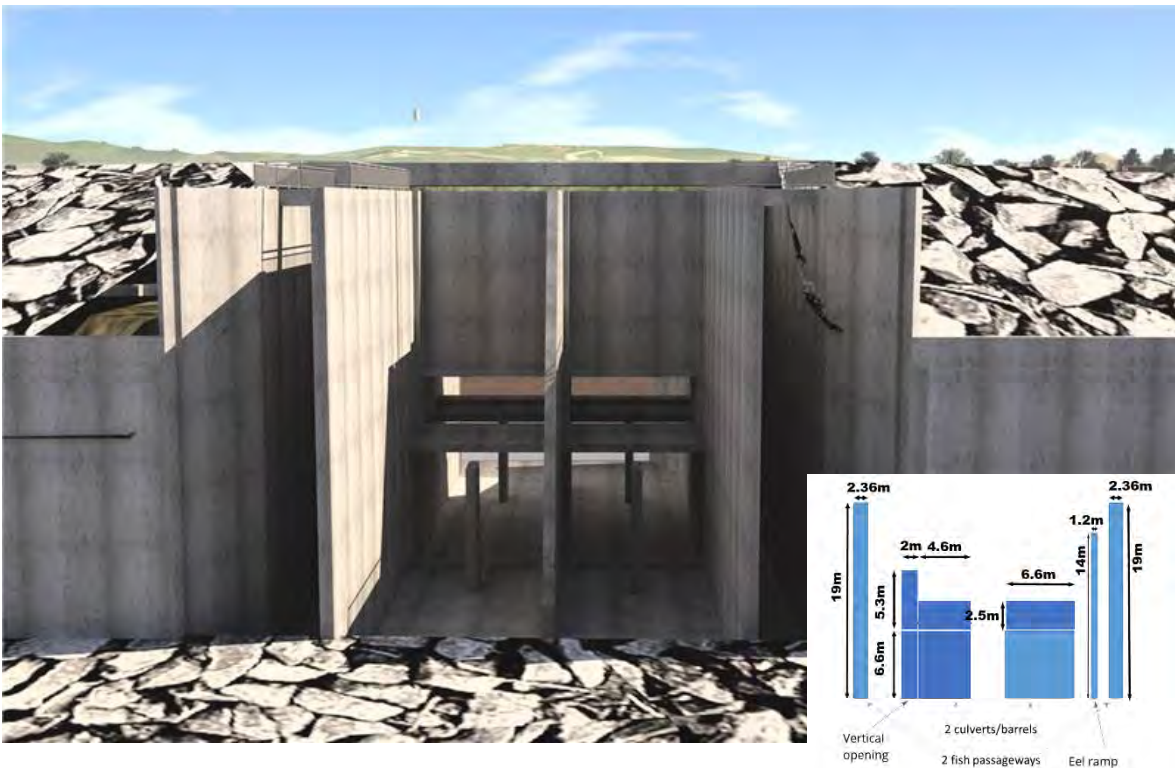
Conceptual Rendering (looking upstream) and Simplified Elevation View Schematic of the New Aboiteau Structure.
